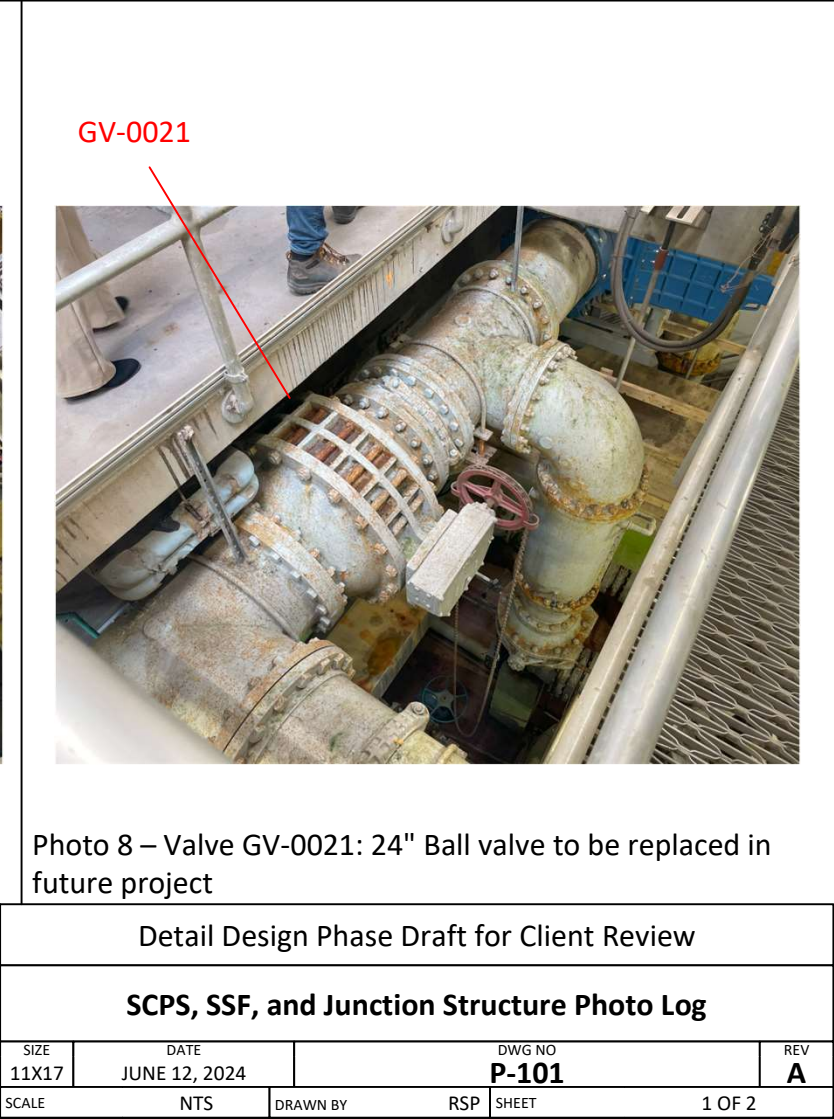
Valve GV-0021: 24" Ball valve to be replaced in future project
